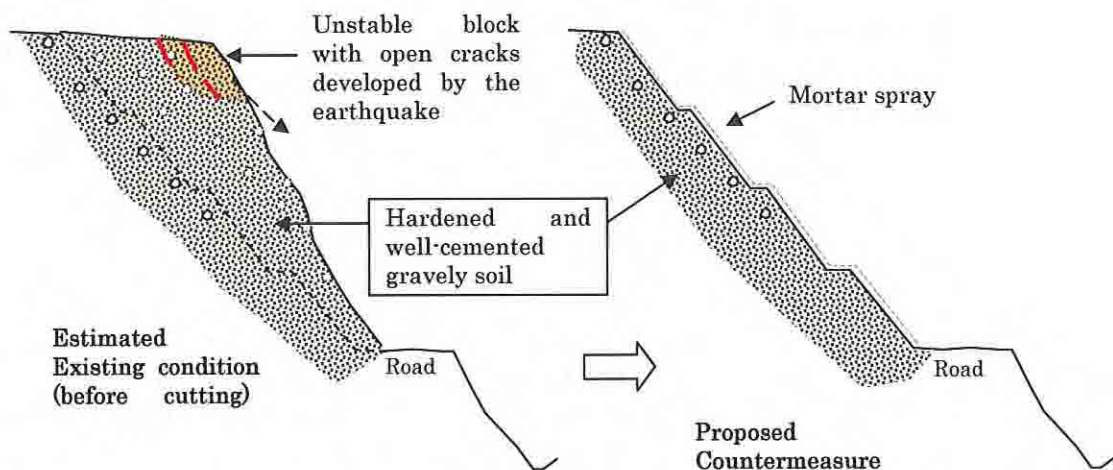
Anticipated geological condition and proposed slope stabilization works at the No.3 Seri Bridge Site Slope in the Detailed Design Stage
